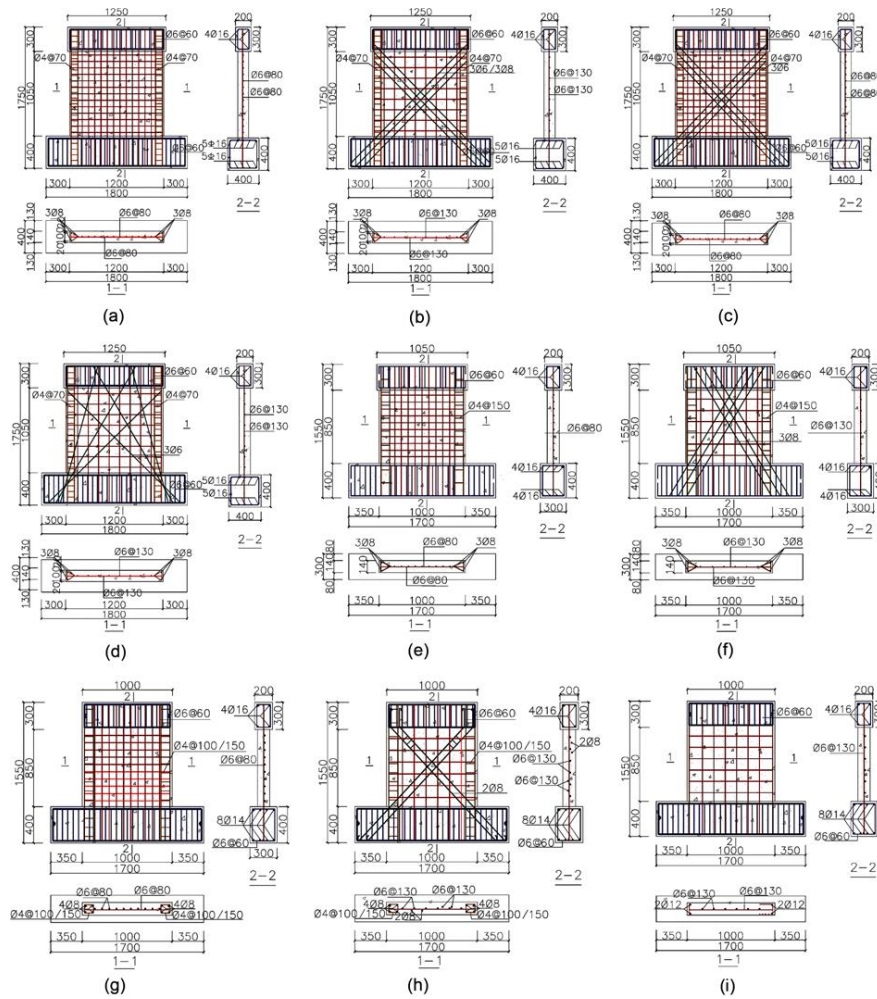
Concrete Shear Wall with Single Layer of Web Reinforcement with different position of Inclined Bar
